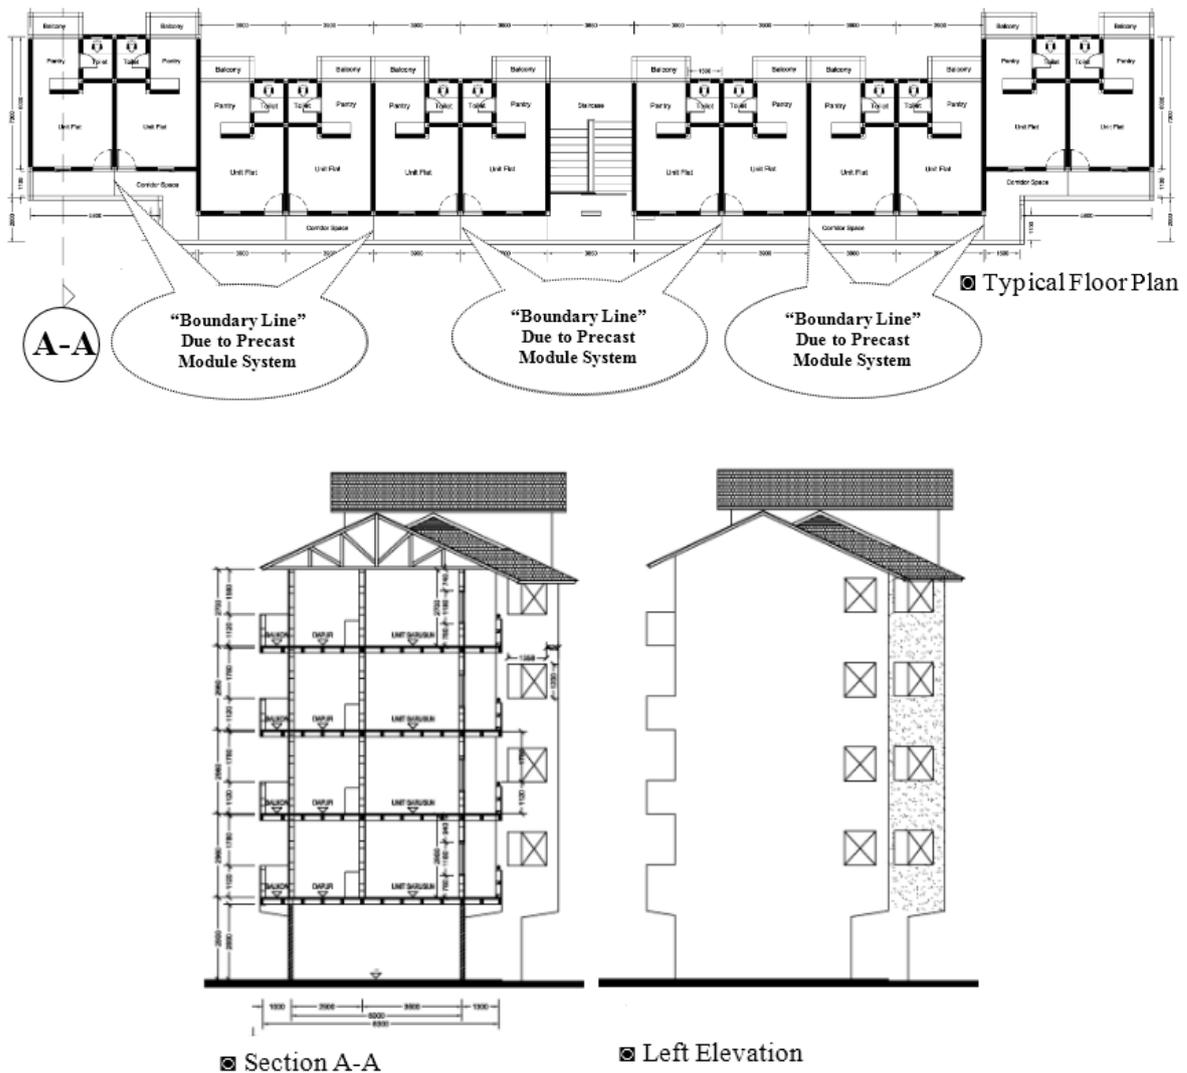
1st to 4th Typical floor plan, section A-A, and left elevation in Seruni 8 block, ‘Rusunawa’ Bumi Cengkareng Indah, Jakarta, Indonesia. Surveyed on August 16, 2016.
